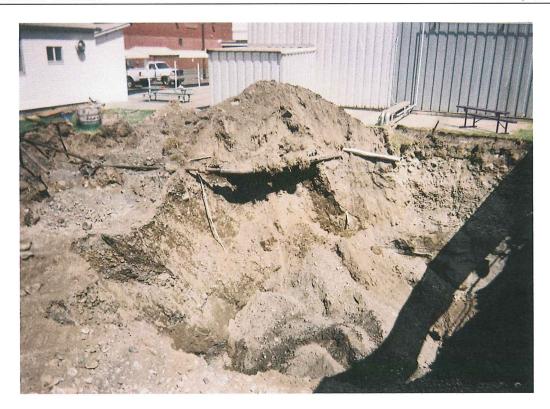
LOOKING NORTHEAST ACROSS EXCAVATION
